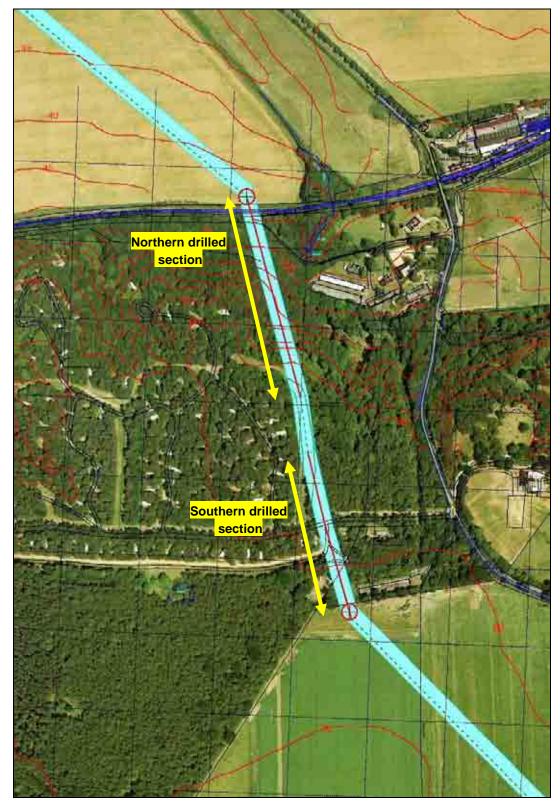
Proposed directional drill at Poppy Line Railway and Kelling Heath, plan view
